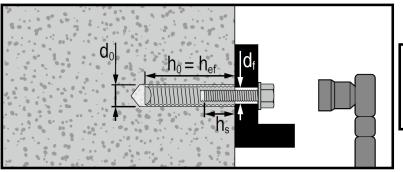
HIS-(R)N Installation in Fully Grouted CMU
